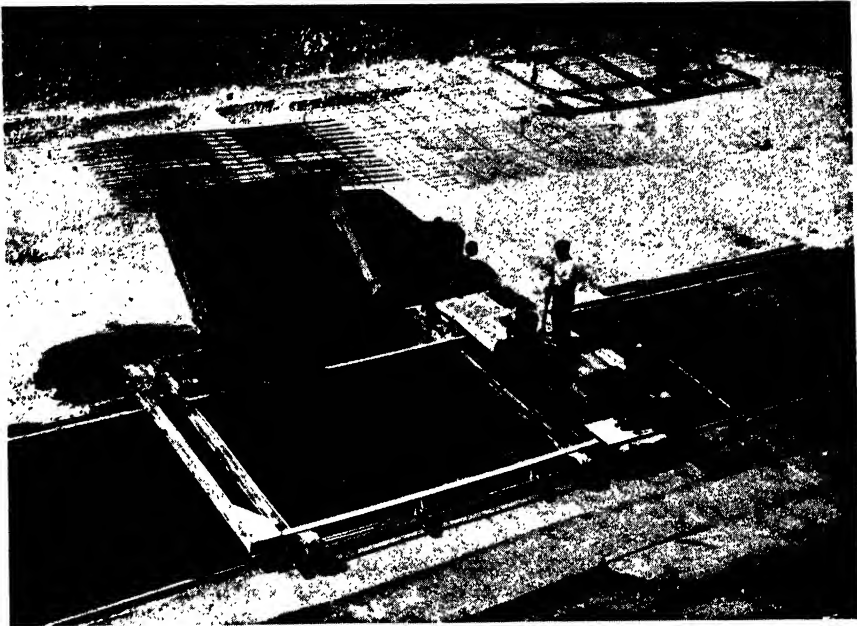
SIDE-TIPPING LORRY FOR DELIVERING CONCRETE
